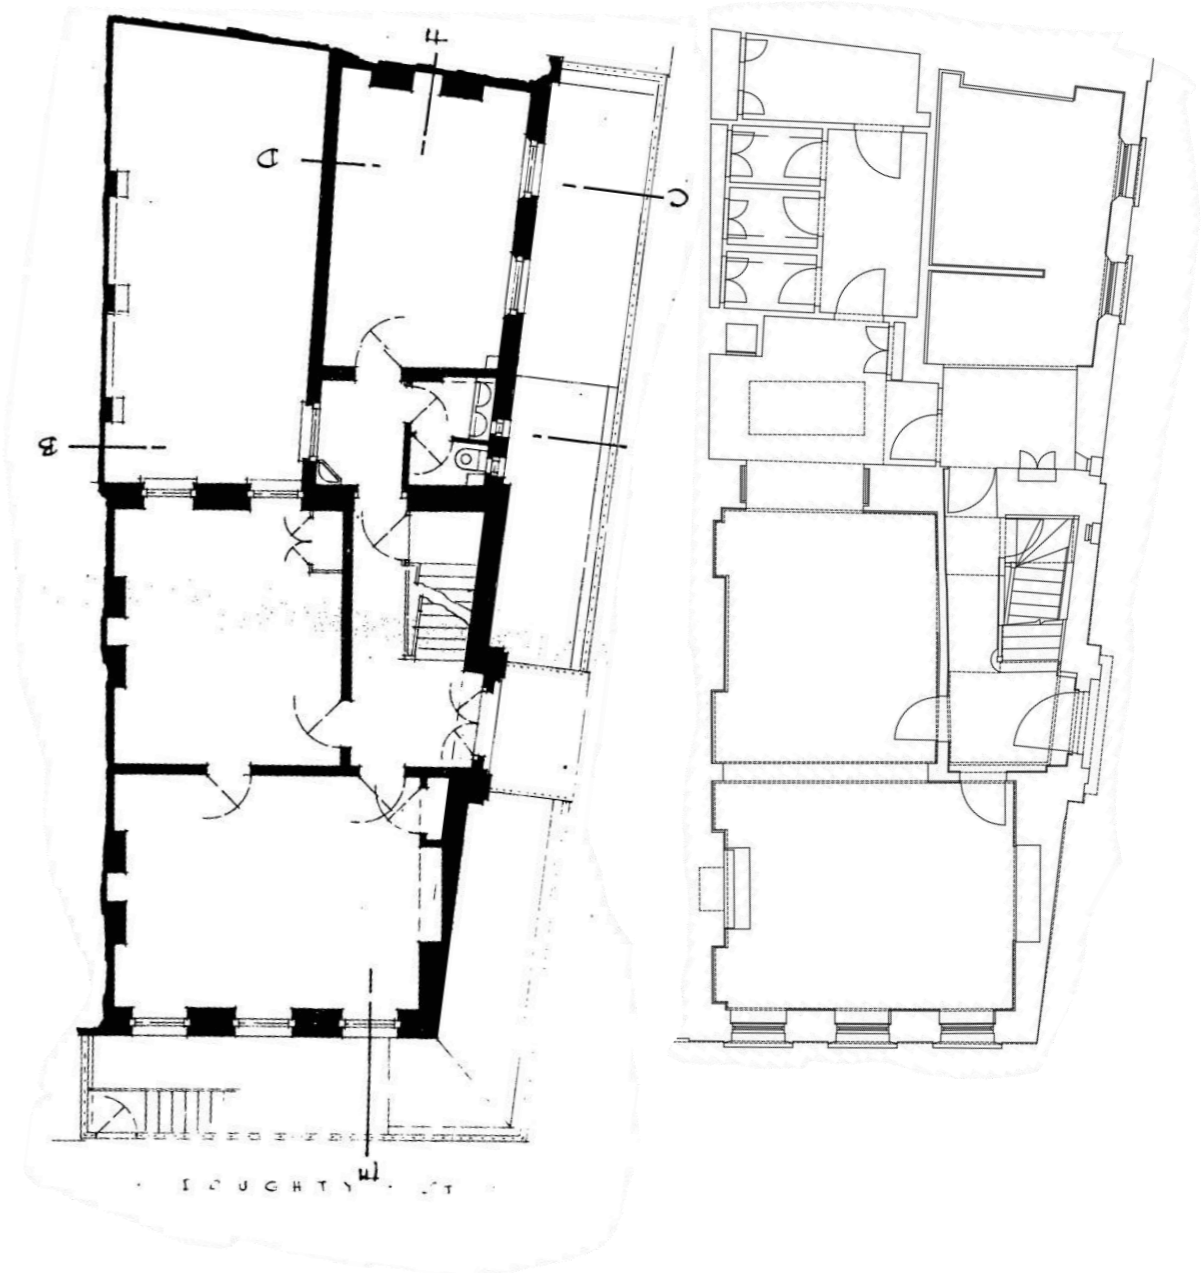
Ground Floor, 1939 drainage plans (left) and existing plans (right).
